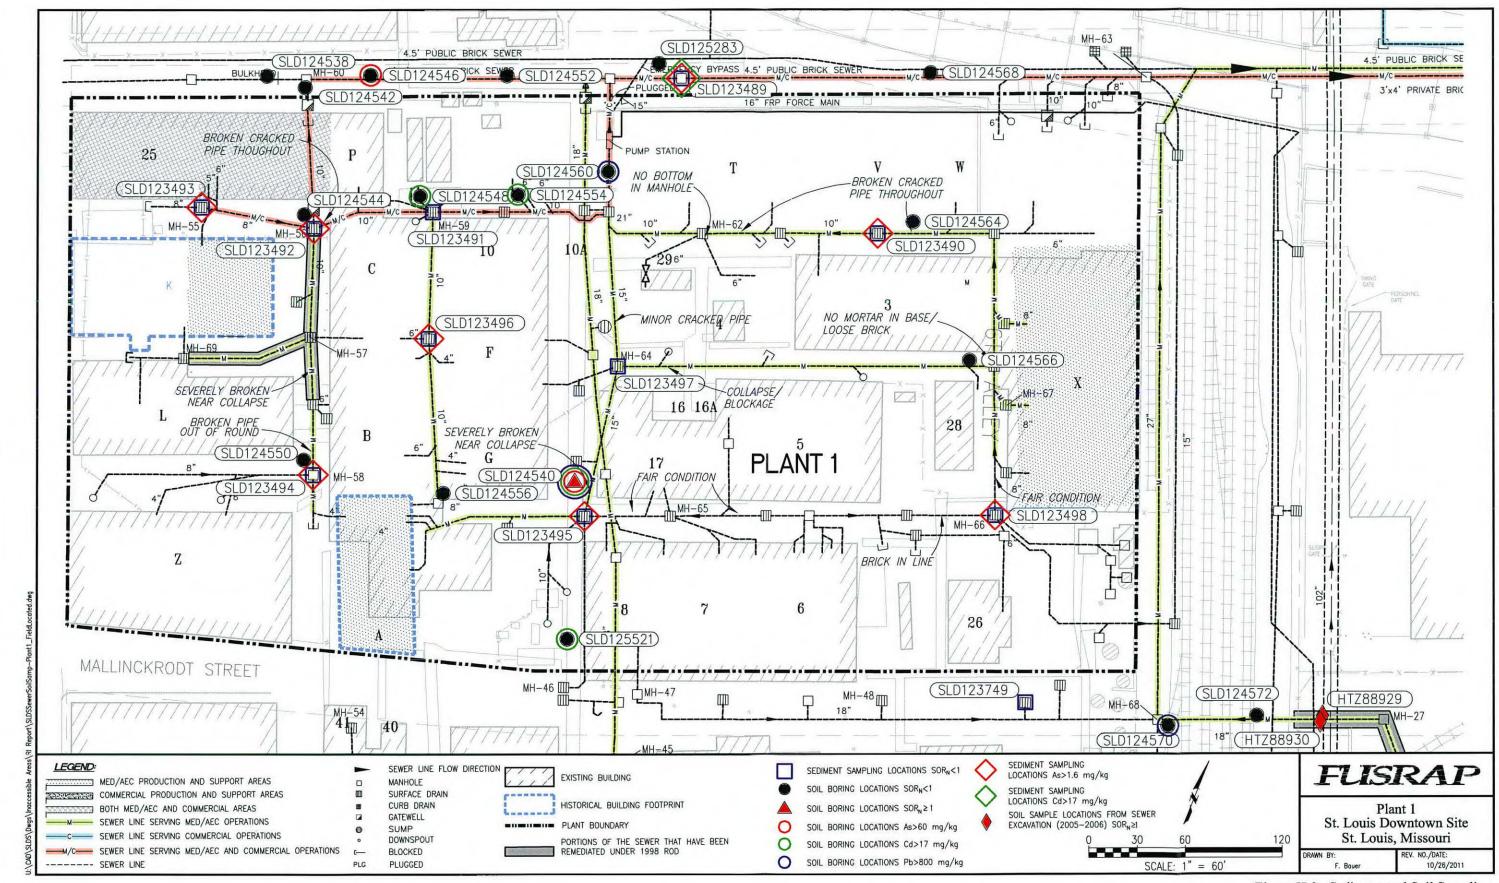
Sediment and Soil Sampling Locations for Sewers at Plant 1
